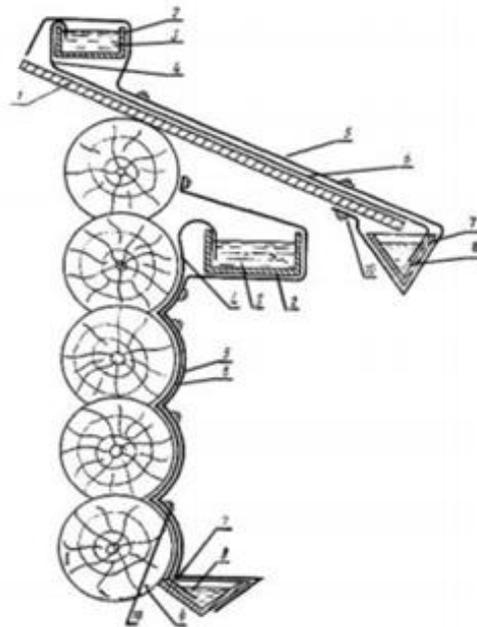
scheme of the panel impregnation of log wall and plank roof [14].
